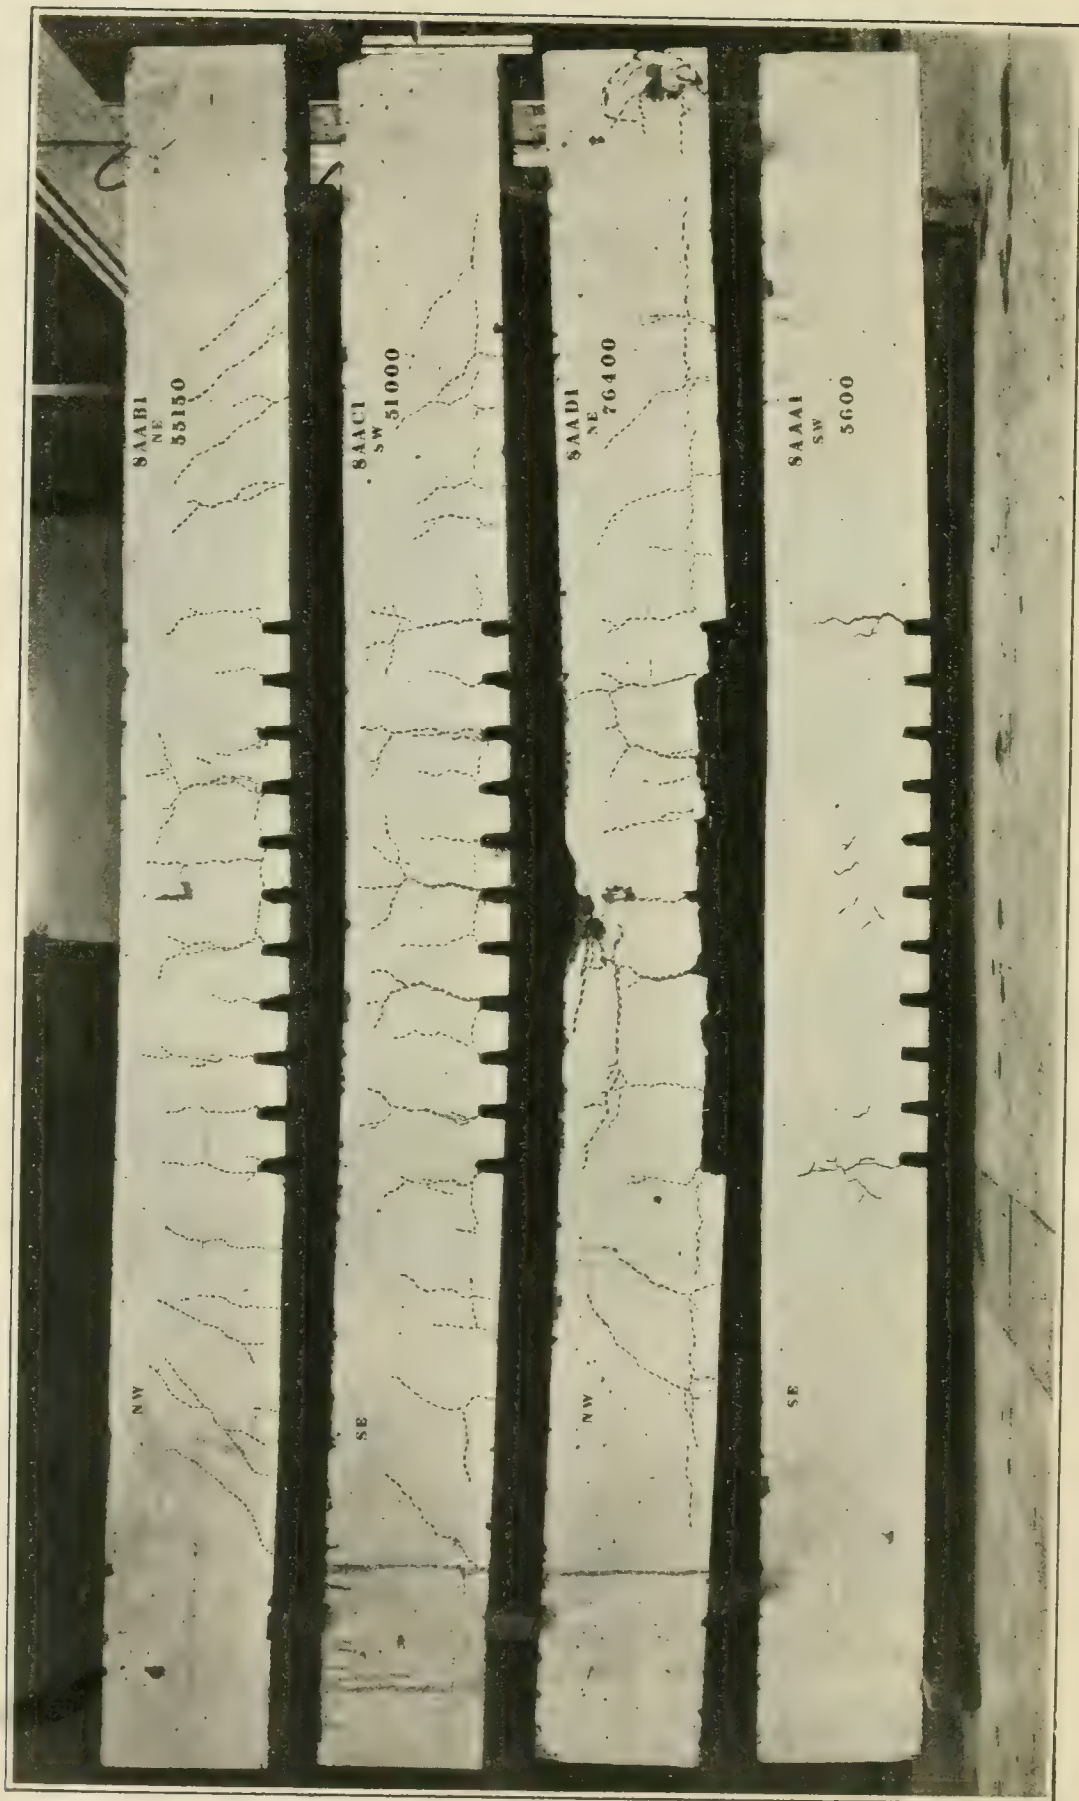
APPEARANCE OF BEAMS WITH LAPPED BARS AFTER TEST.
